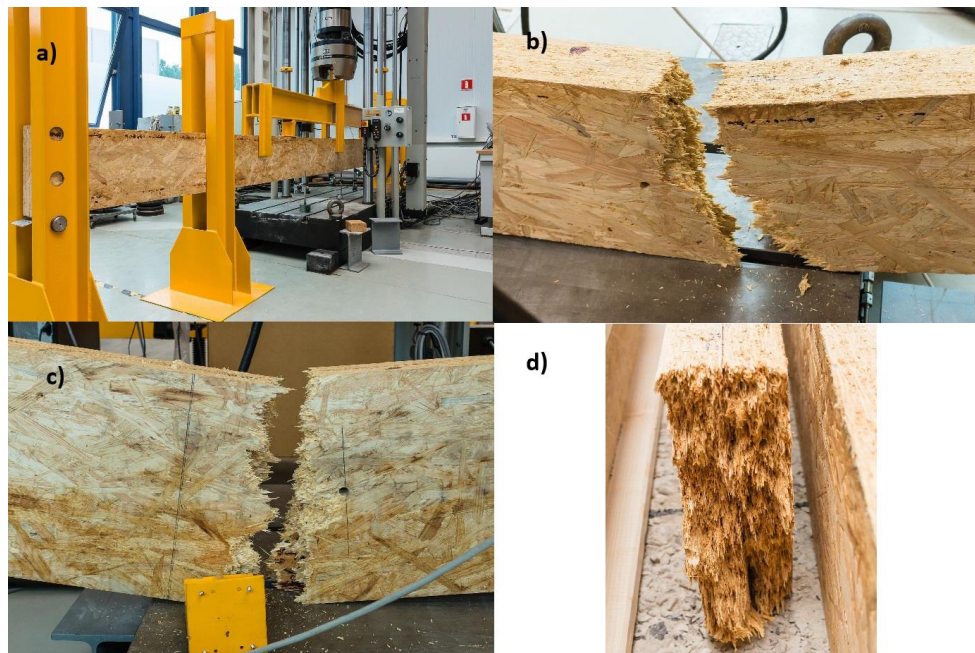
Laminated beam on the test stand a), left and right side of the beam after failure b), c), and cross-sectional view after failure d)
